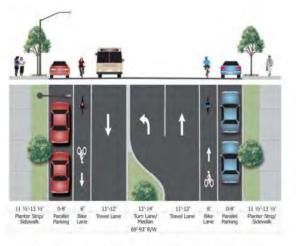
CITY OF WILSONVILLE CROSS SECTION STANDARD FOR COLLECTORS
